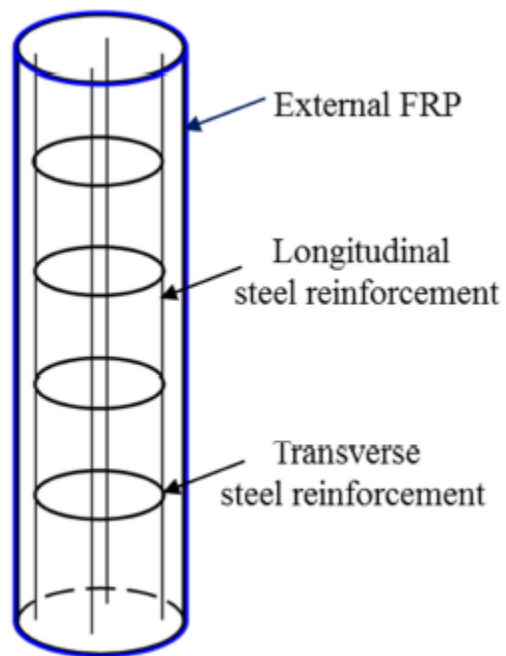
Typical sketch of a RC column confined with external FRP, which is typical example of structural members considered in this study (Dan Hu)
